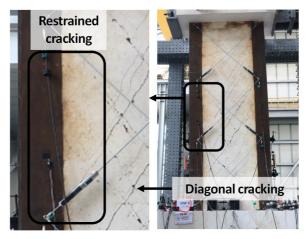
Restrained concrete cracking near the boundary steel U-section.
